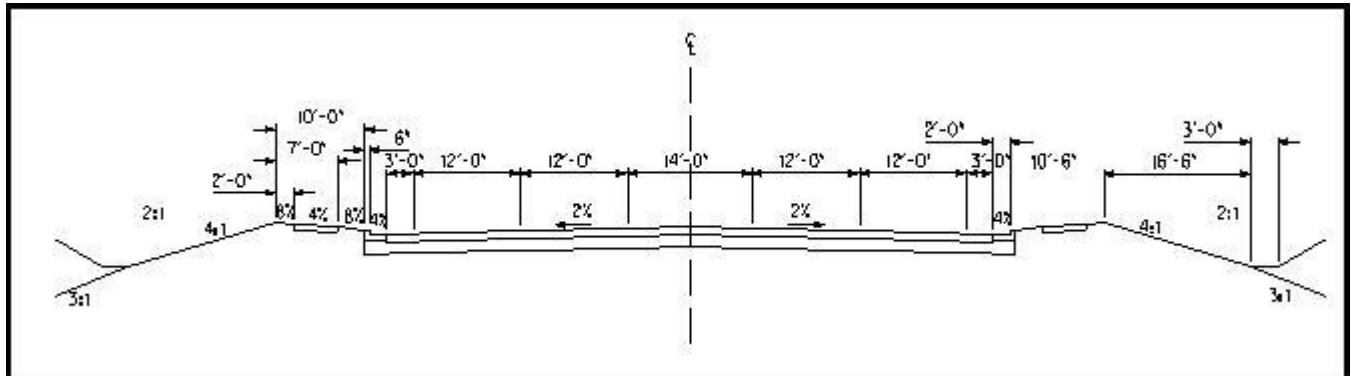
Typical Section: Five-lane Curb and Gutter
